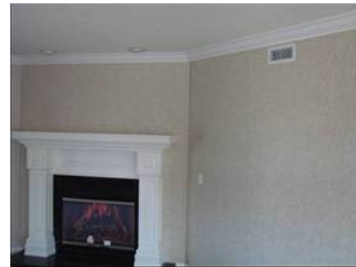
Interior view of prototype house with high side discharge outlet.
